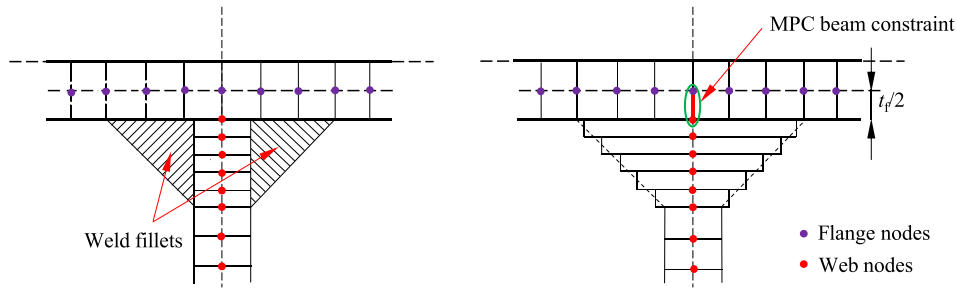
Illustration of modelling technique for accurately representing the geometry of the welded I-sections.
